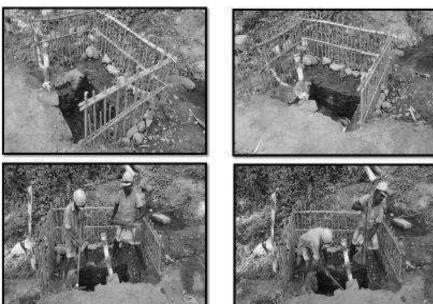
Bio silt trap to avoid debris of catch fit of culvert Location - R 14
